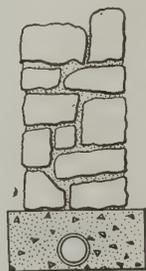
Proper Place for Tile Drain When Carried Under a Wall.
